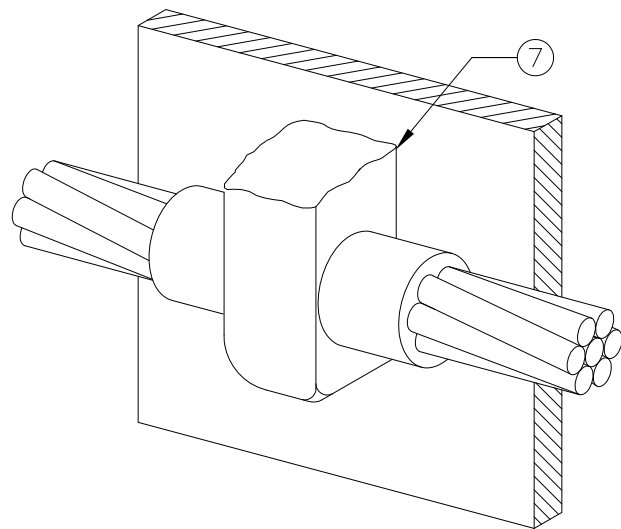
D – HORIZONTAL THROUGH WIRE TO A HORIZONTAL STEEL SURFACE. WIRE OFF THE SURFACE.
